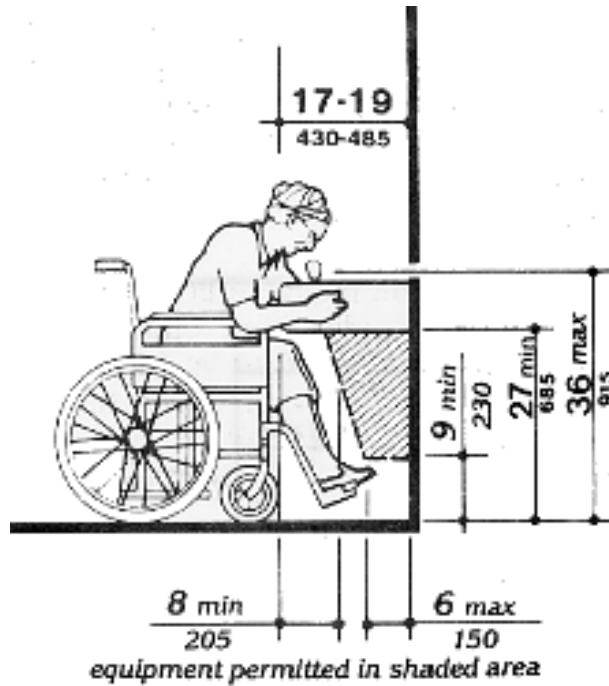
Drinking Fountains and Water Coolers - Clear Floor Space
